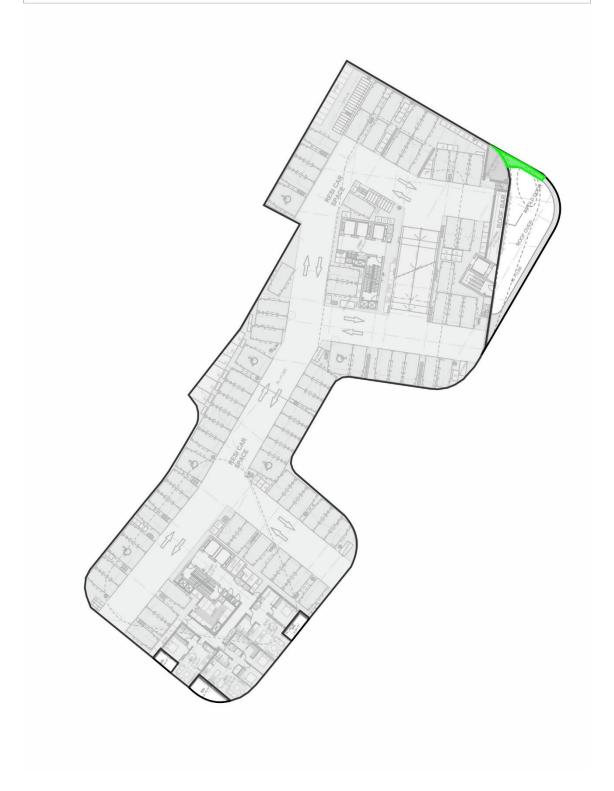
Suggested Retention of Architectural/Landscape Elements – Level 02 Plan
